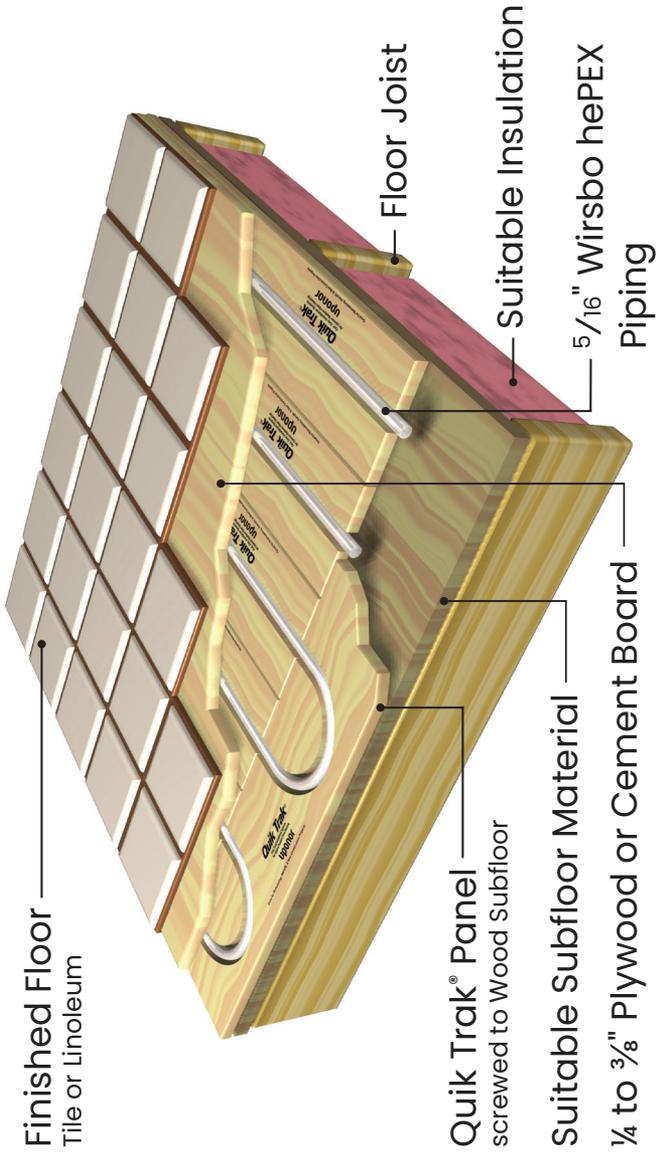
Quik Trak over a wood subfloor with tile/linoleum floor covering
